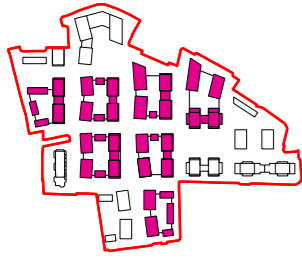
Configuration of a typical Courtyard building typology showing the internal, private settings and highlighting views out to the north and south.
